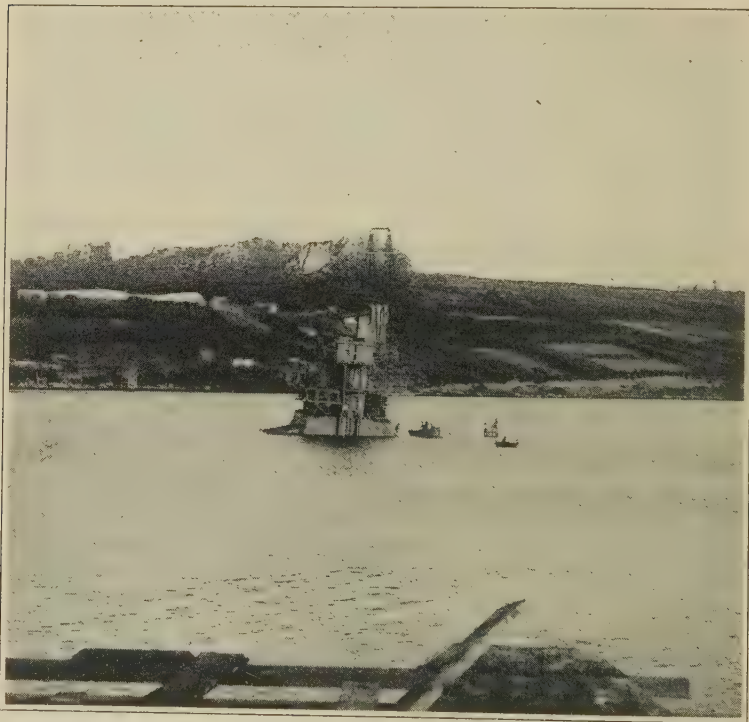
SINKING PNEUMATIC CAISSON FOR PIER NO. 2 OF 600 FT. REINFORCED CONCRETE ARCH BRIDGE AT BREST, FRANCE
